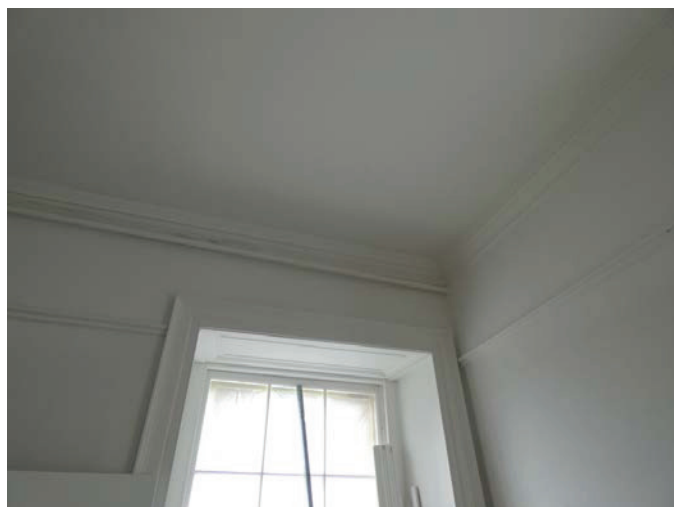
(right): The east elevation of ground floor Room 15, viewed from the west
